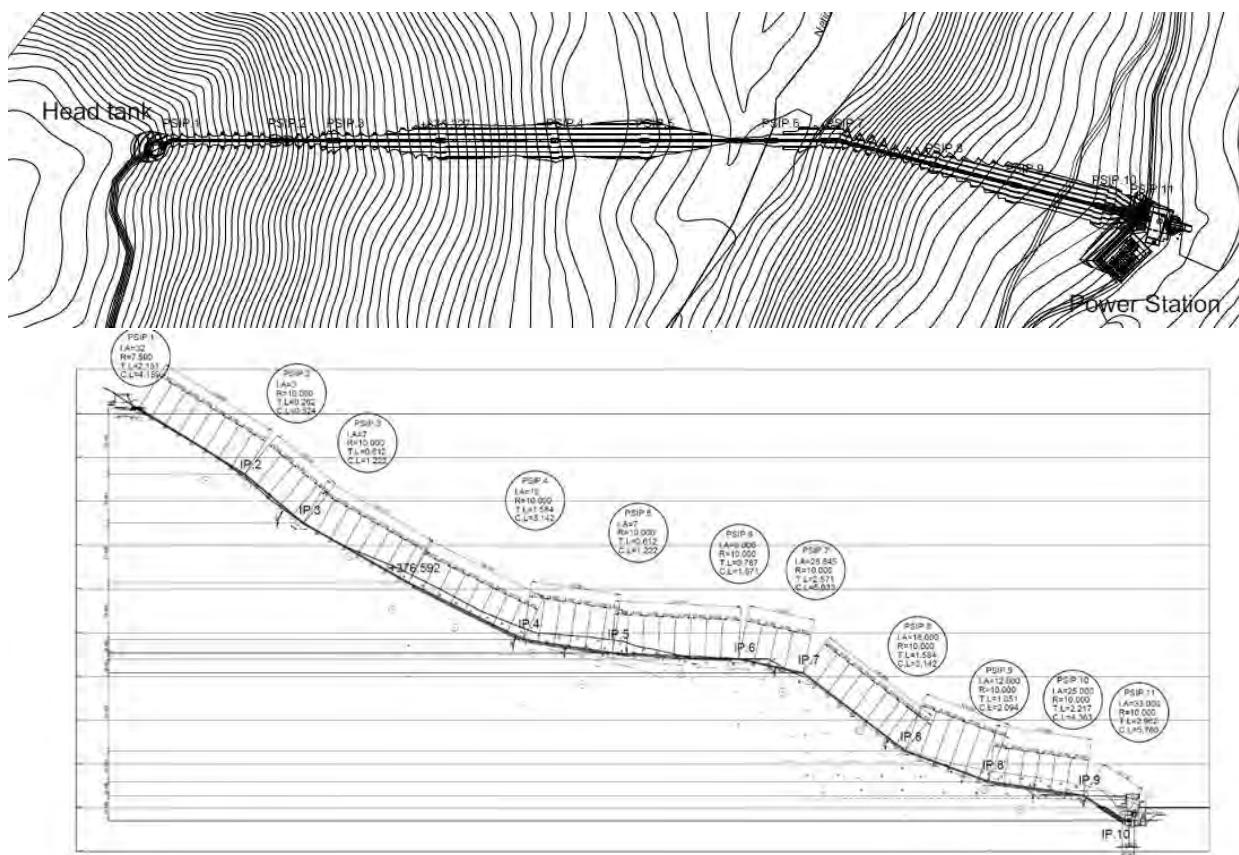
Layout Plan and Longitudinal Section of the Penstock
